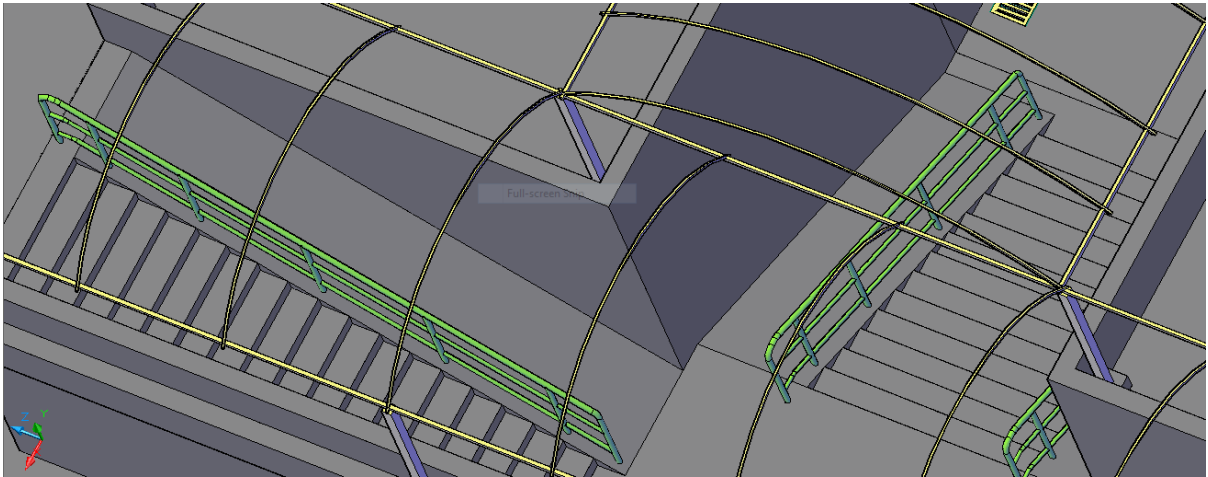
Handrail for underpass pedestrian crossing that connects the two sides of walkway on railway.
